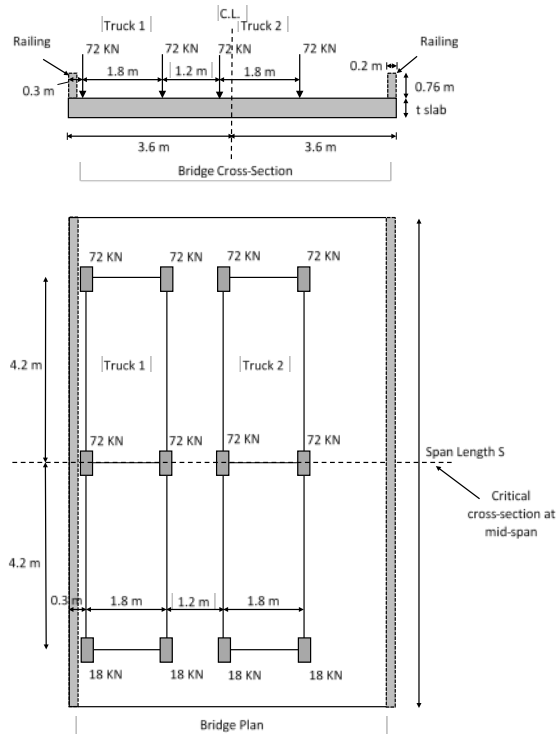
Typical cross-section and layout for a two-lane bridge subject to Edge loading condition with base case railings (X1).
